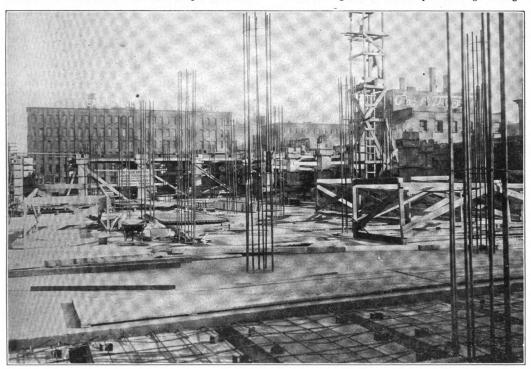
The Second Floor During Construction, Showing the Round Rods for Reinforcing the Columns.
